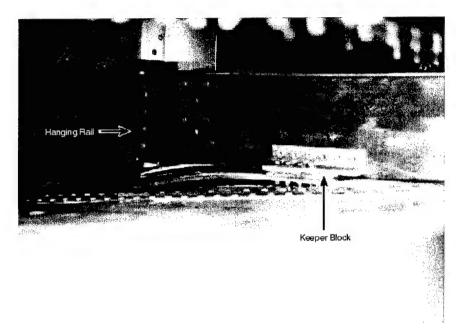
HANGING FLANGE AND KEEPER BLOCK DAMAGE
